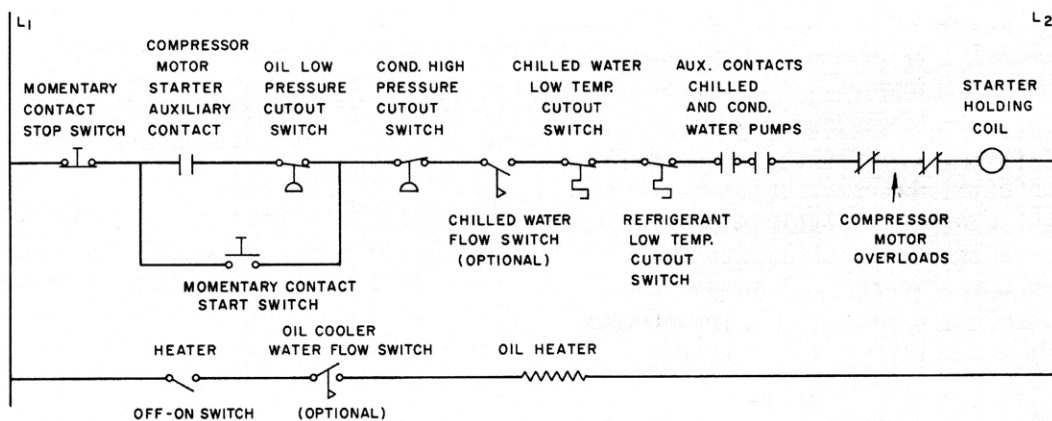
TYPICAL SAFETY CONTROL SYSTEM, OPEN MOTOR-DRIVEN MACHINE
